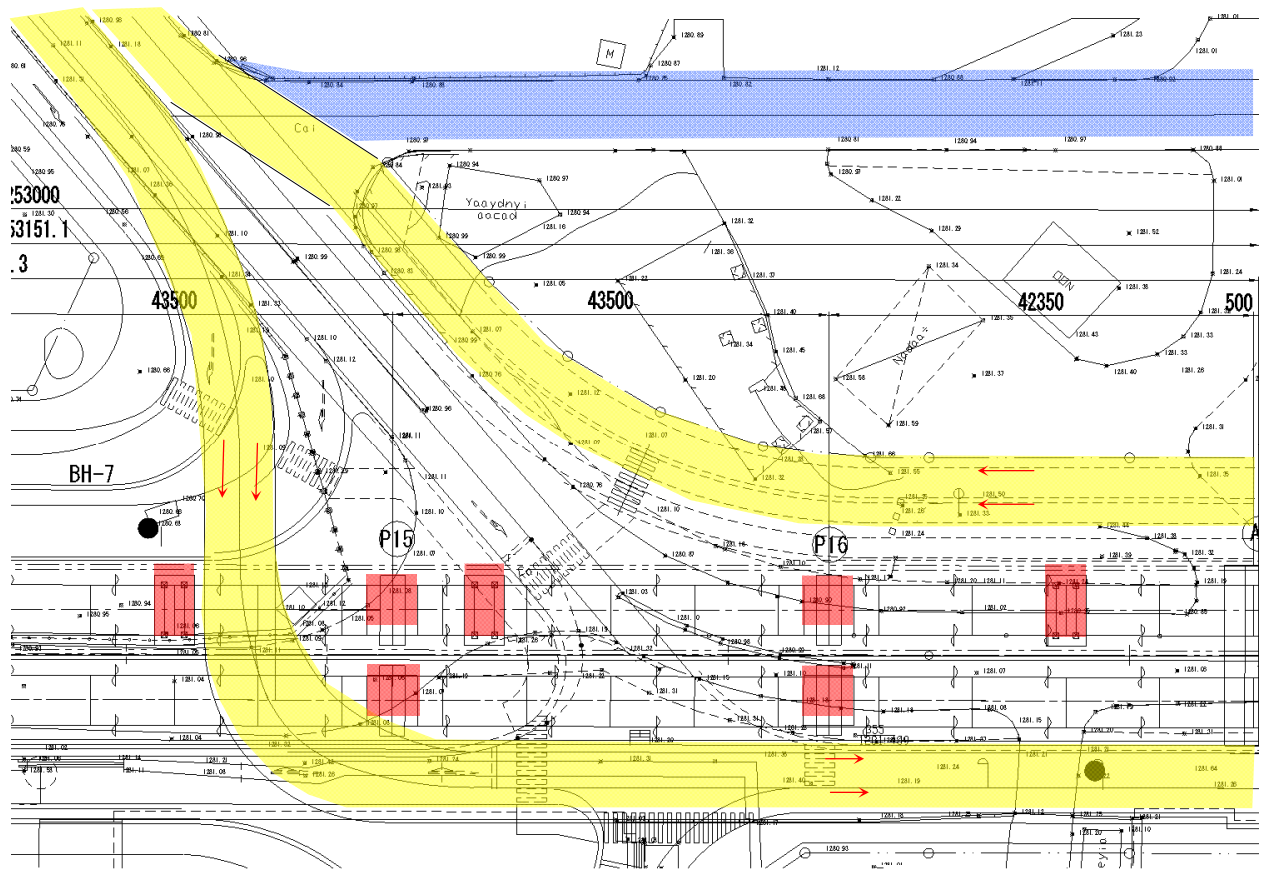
Arrangement of Equipment and Structures for the Crane-Bent Girder erection (between P11 and A2)
